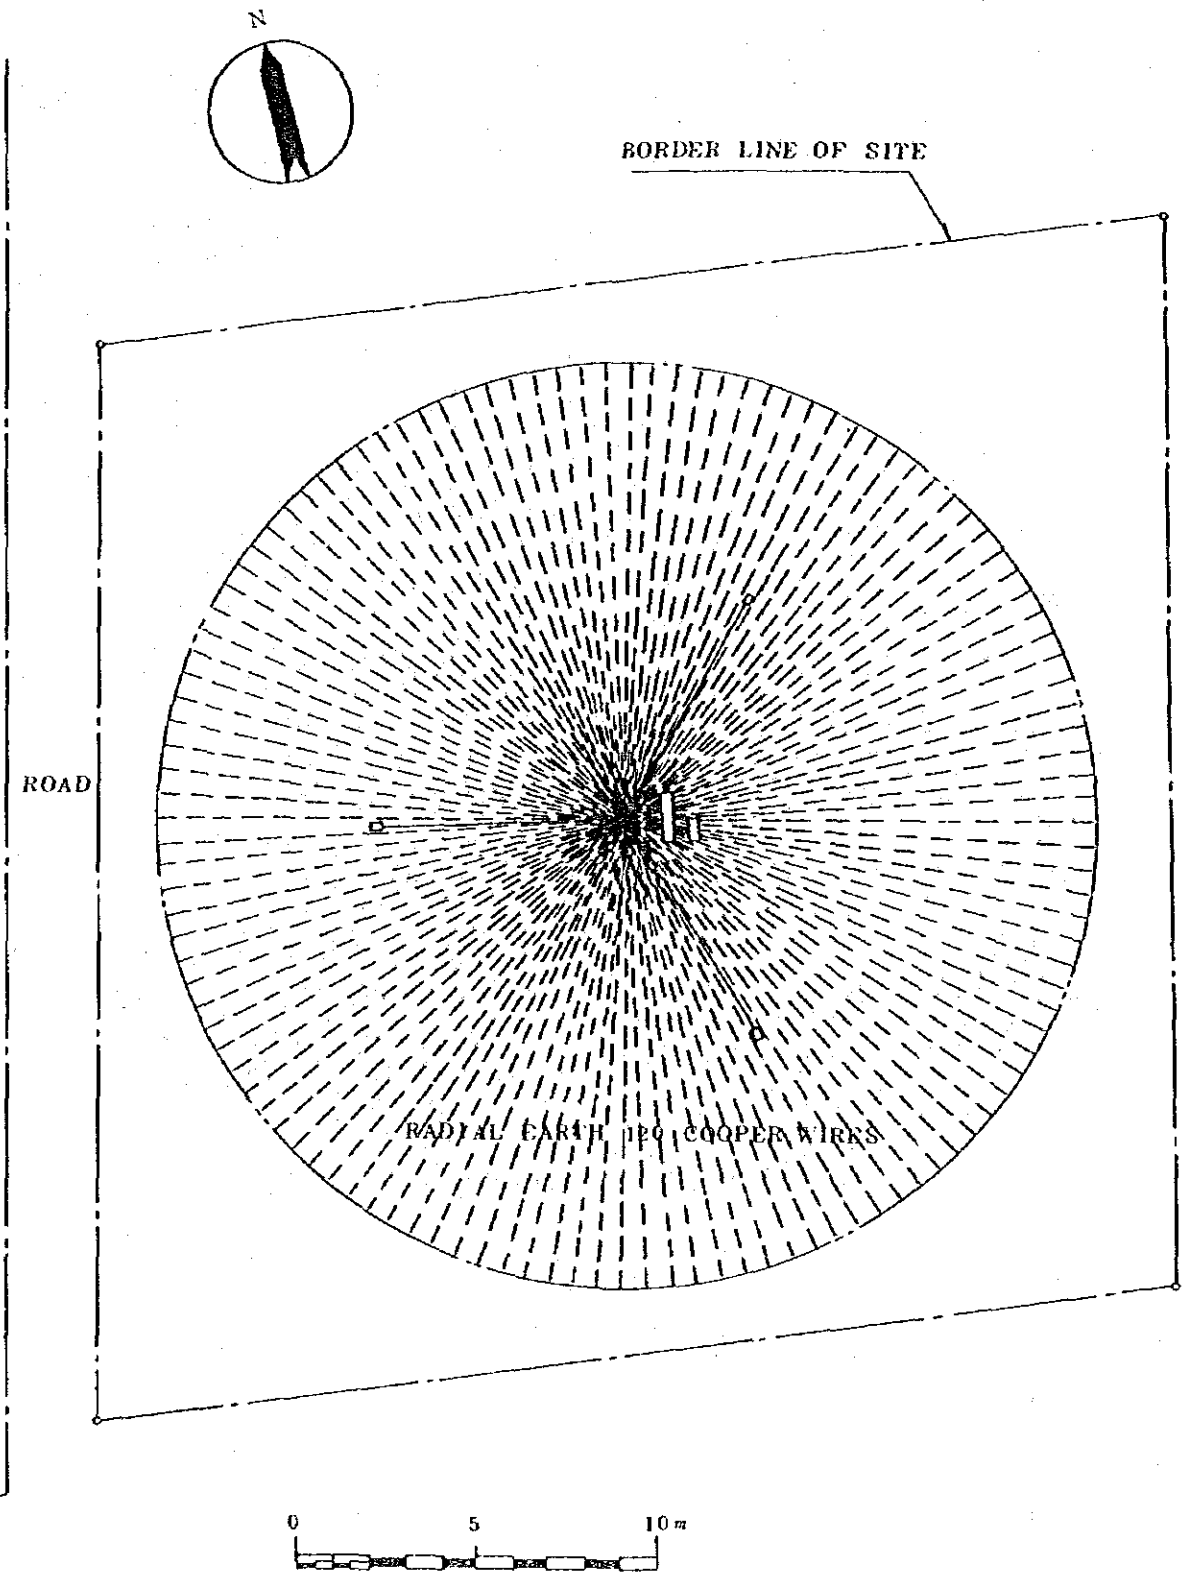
Layout of Tower and Earth of Atbara
